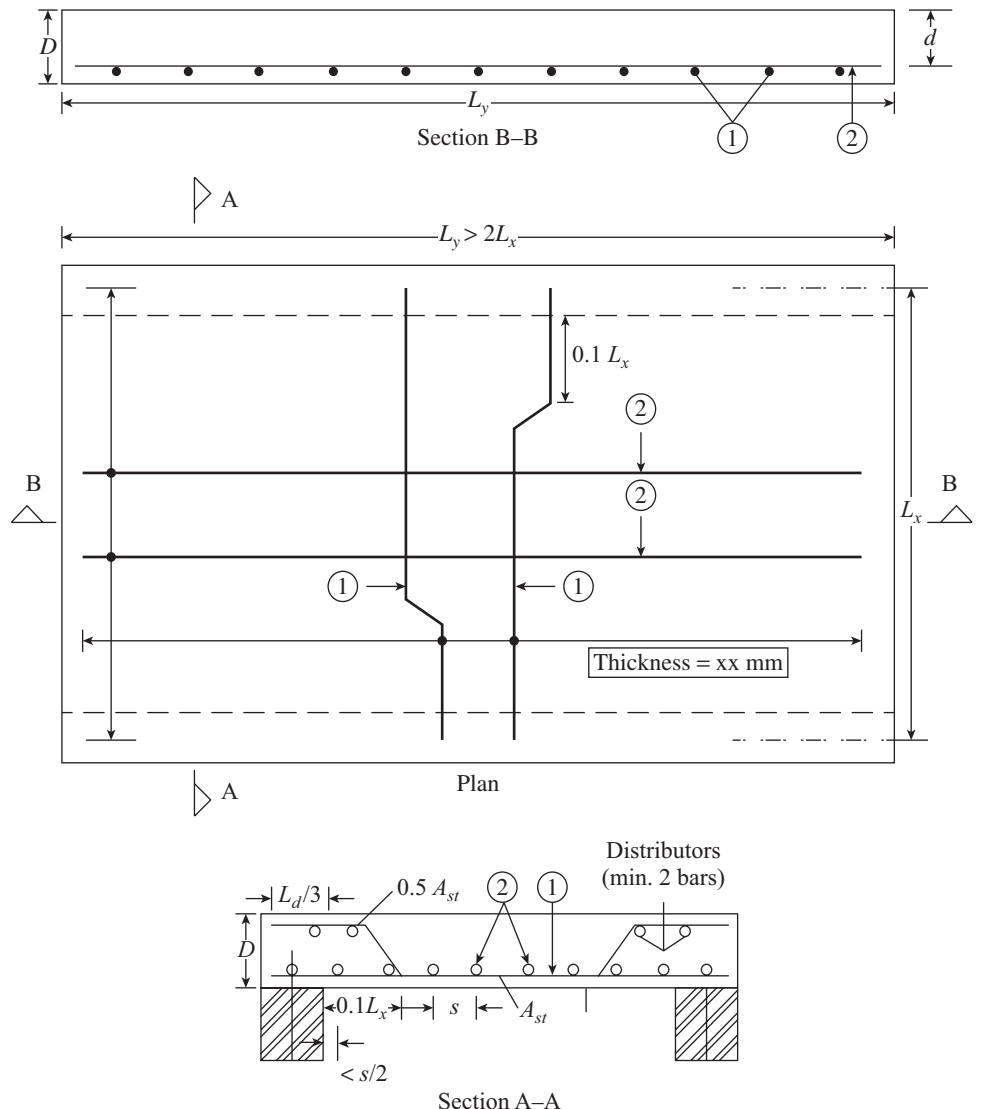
Detailing of reinforcement in simply supported one-way slab with uniformly distributed load
